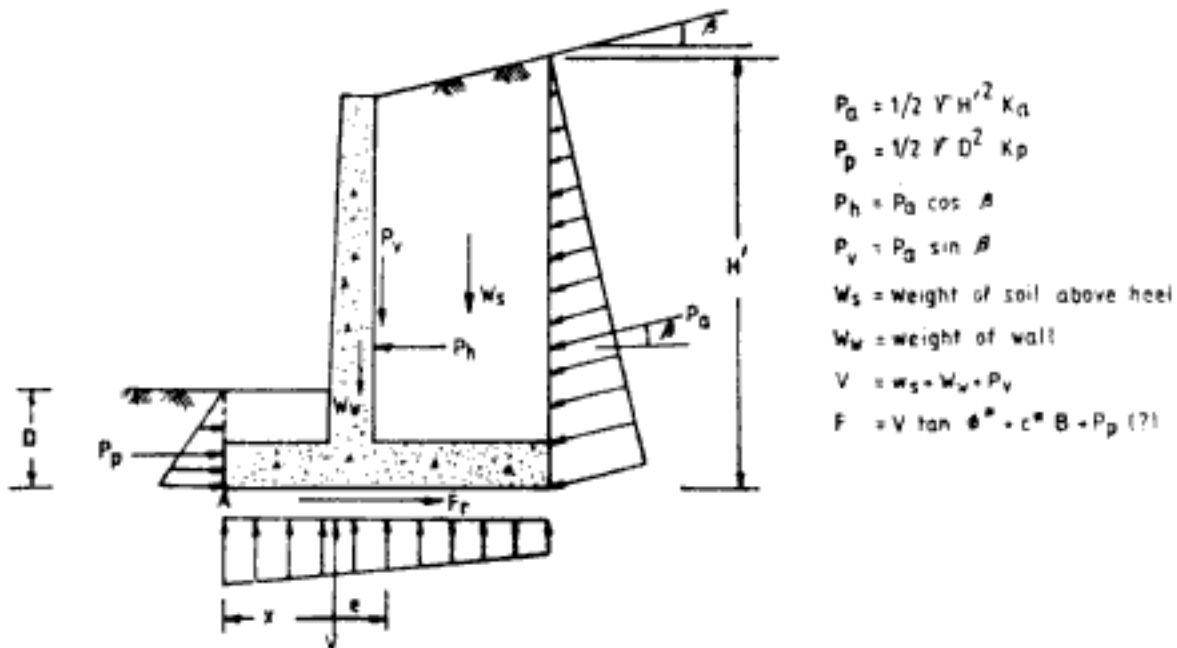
Forces on cantilever and counterfort retaining walls
